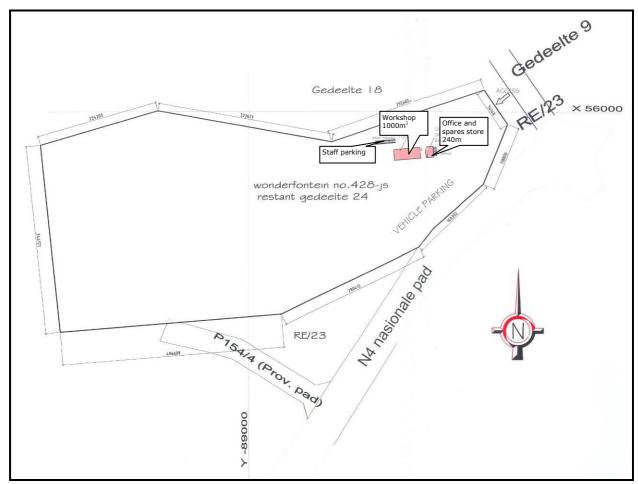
Proposed site development plan (designed by LMH Designs, 2015)
